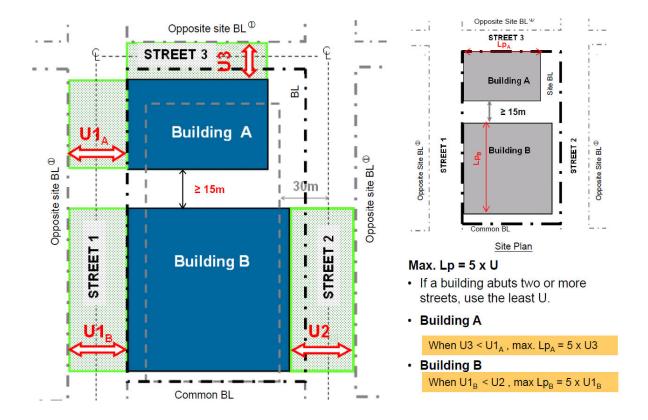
Defining the mean width of street canyon (U) and the maximum permissible continuous projected façade length (L_p)
